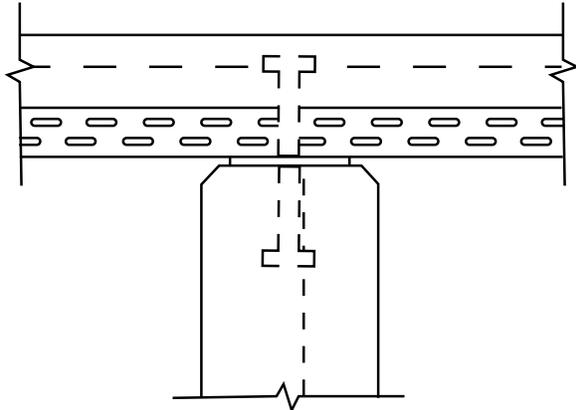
CONCRETE OR CMU WALL WITH EMBED PERPENDICULAR
